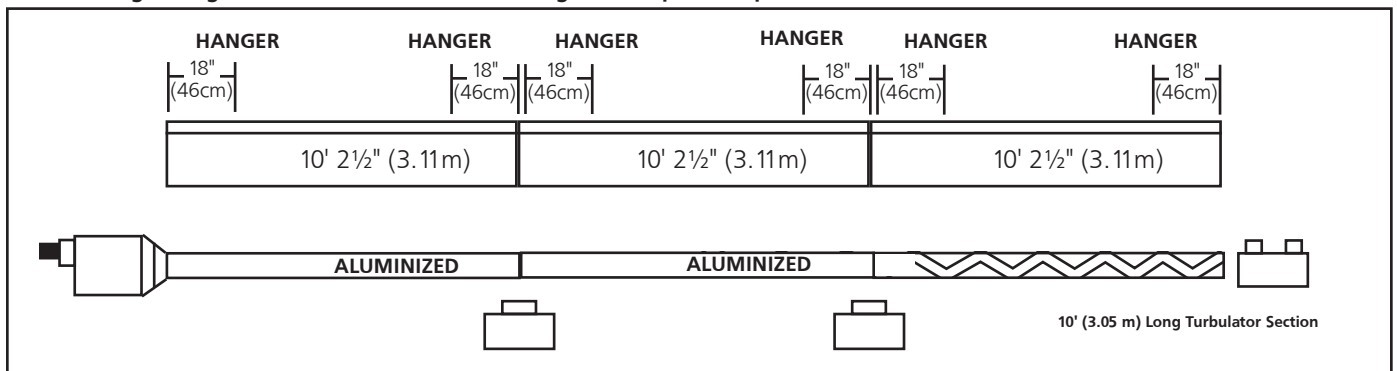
D: Ener-Radiant SP Model ERSP-100 Assembly Overview
